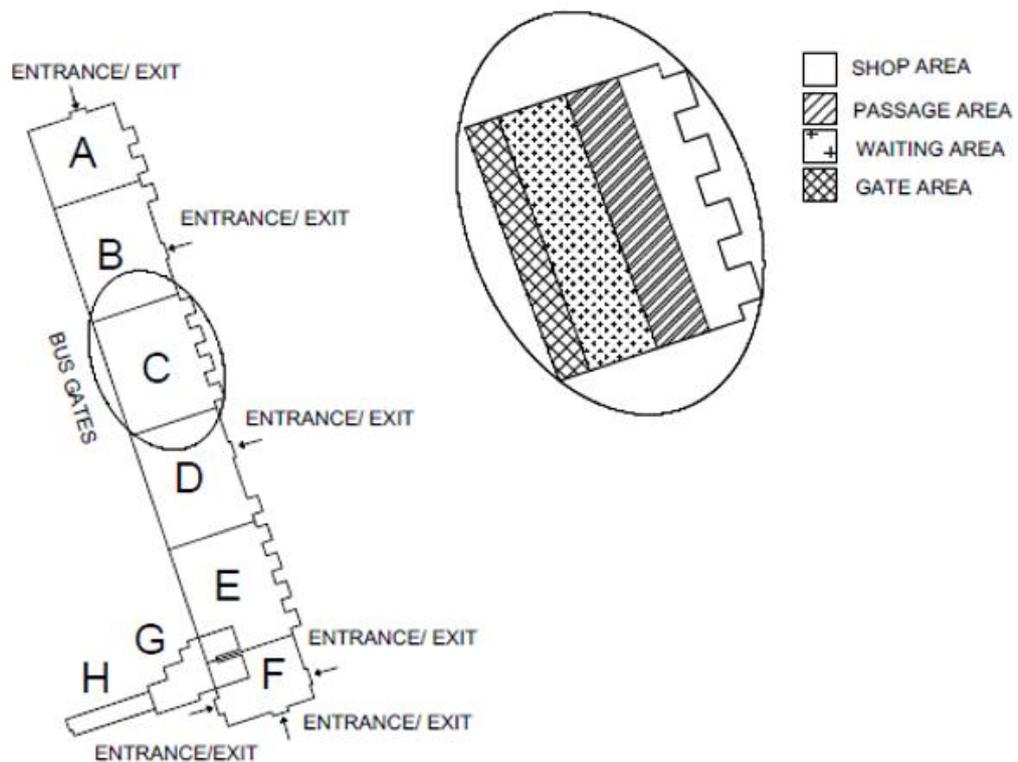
2: Schematic floor plan of the Nils Ericson Terminal
